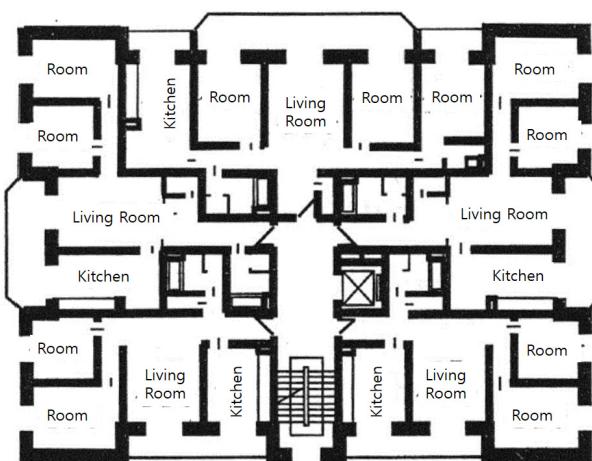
An example of apartment plan in D.P.R.K (North is bottom side) (Vol.13-03)
